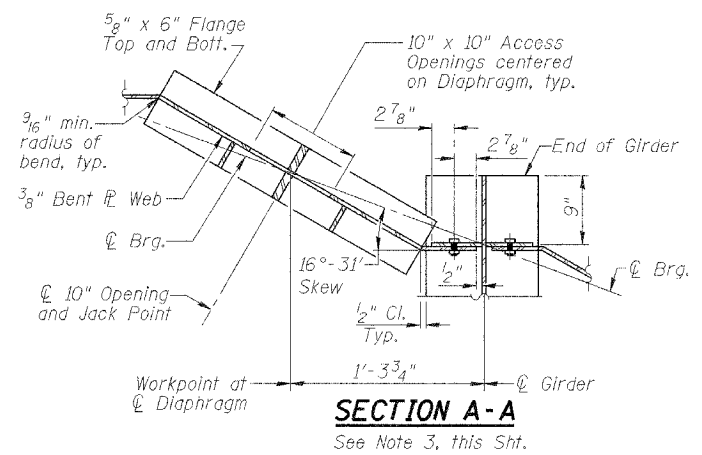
DETAIL AT INTERIOR DIAPHRAGM (D2)
